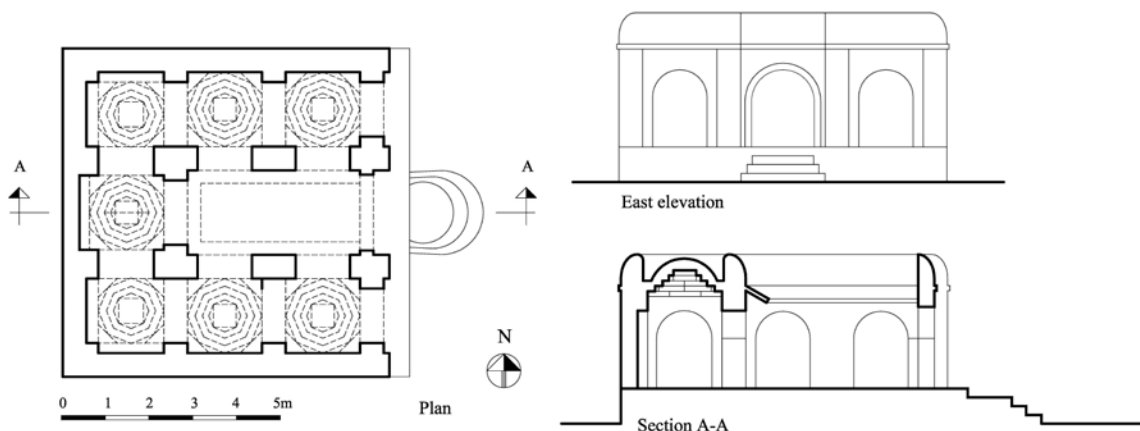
Fudam, old building built around a patio in the cremation grounds, plan, section and east (front) elevation showing the building in its original condition.
